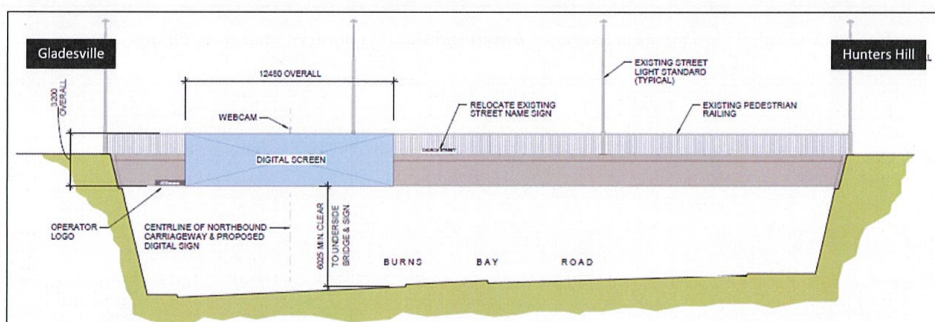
| Digital sign southern elevation (outbound) (Source: Amended Plans)
